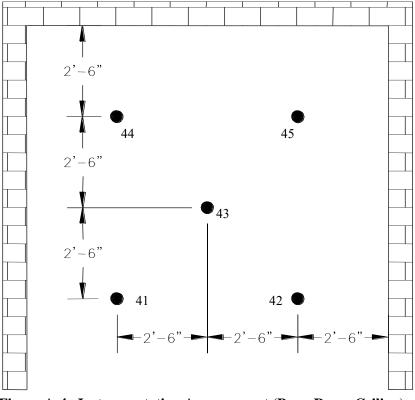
Instrumentation Arrangement (Burn Room Ceiling).
